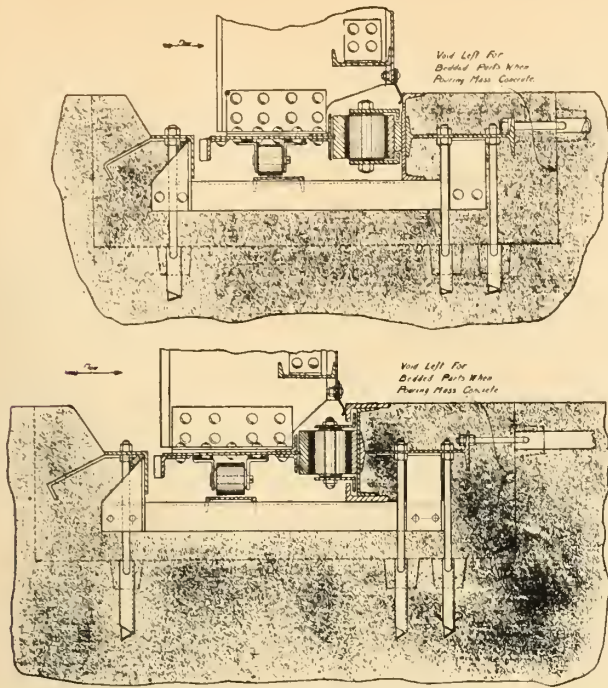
Sections through Bedded Parts, showing Anchors, also Roller Trains, Guides, Moving Roller Paths, and Spring Seals.
